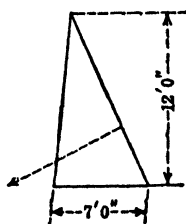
Retaining-wall with Triangular Cross-section. Area, 42 sq in
